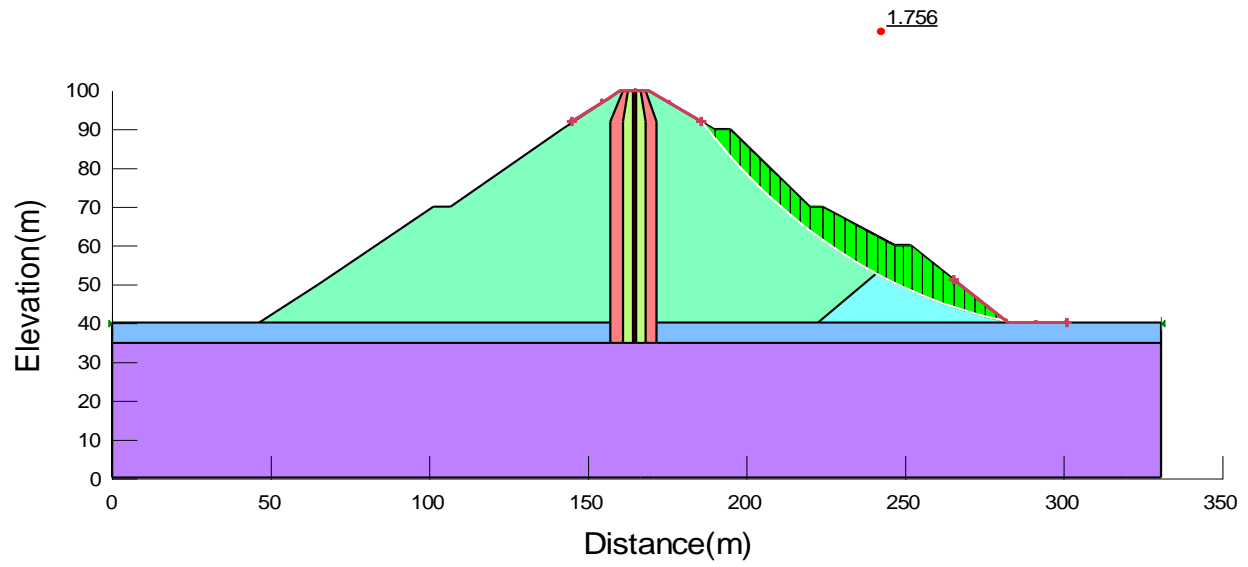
8: Slope Stability at end of construction without Earthquake AC (D/S)
